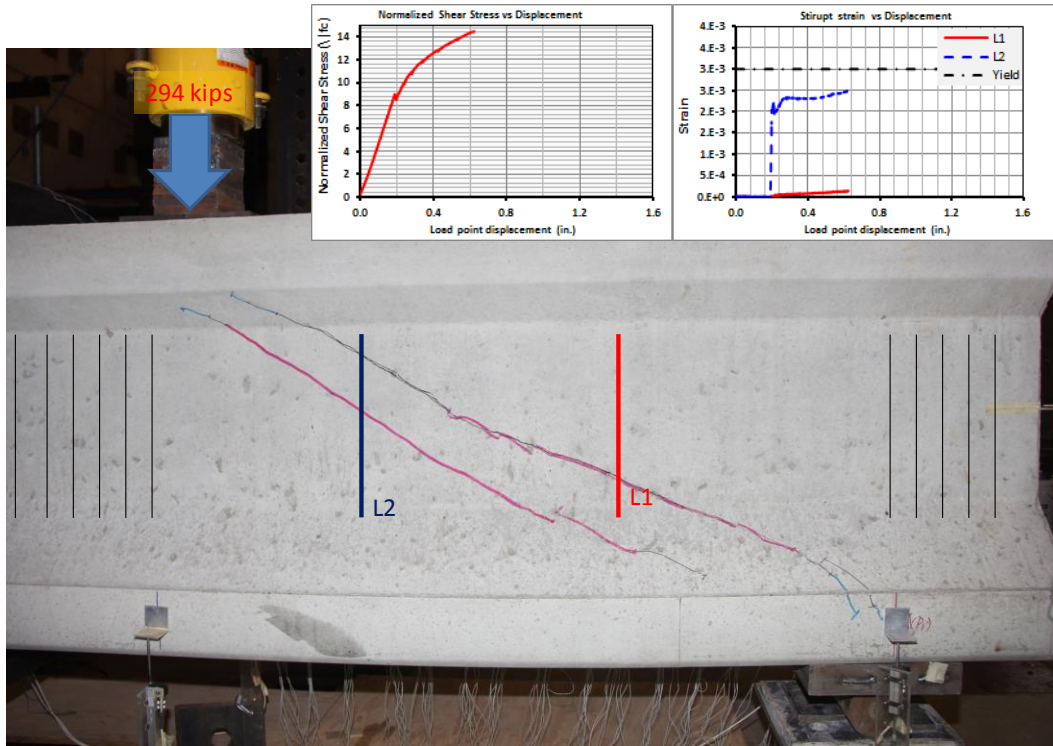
Girder 2-Test 1 peak load prior to failure
